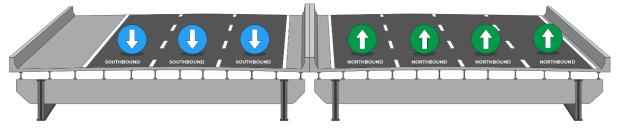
Proposed S. 3rd Street Bridge Configuration
